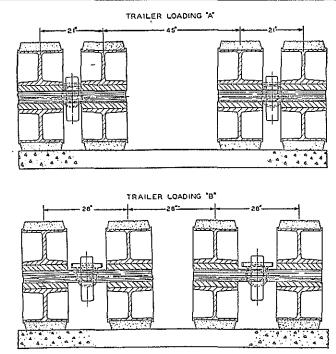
TYPICAL WHEEL ARRANGEMENTS FOR HEAVY-DUTY TRAILERS.
